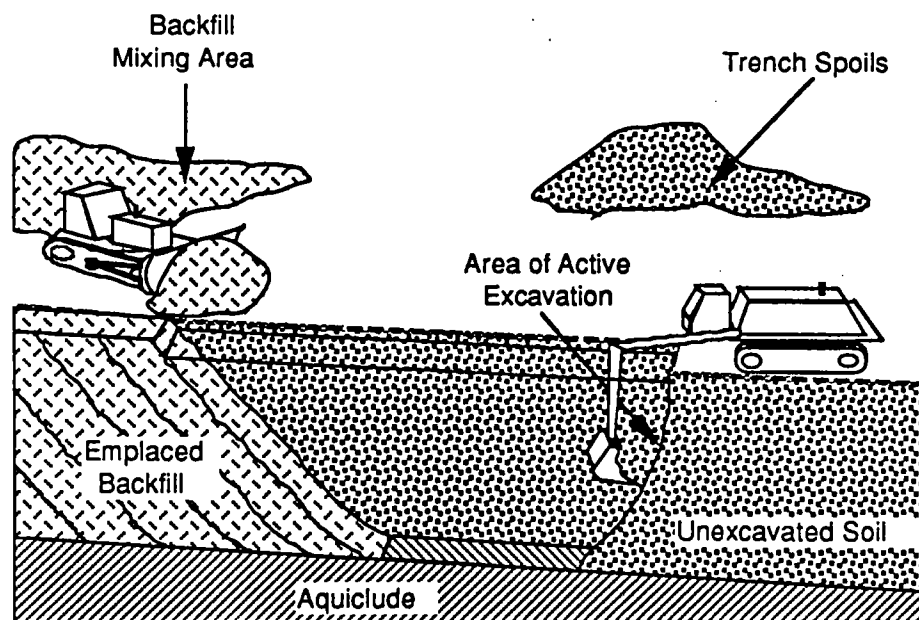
Diagram of Construction Process for Soil-Bentonite-Backfilled Slurry Trench Cutoff Wall.
